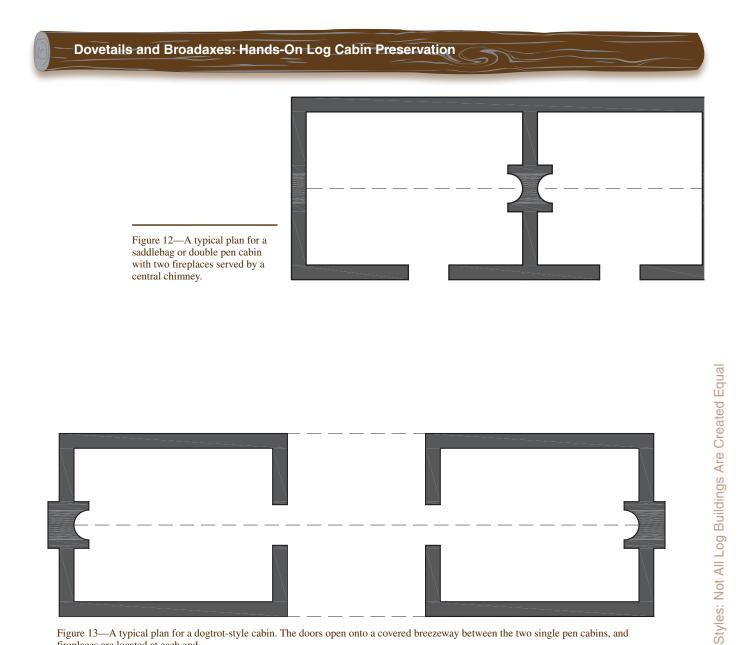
A typical plan for a dogtrot-style cabin. The doors open onto a covered breezeway between the two single pen cabins, and fireplaces are located at each end.
